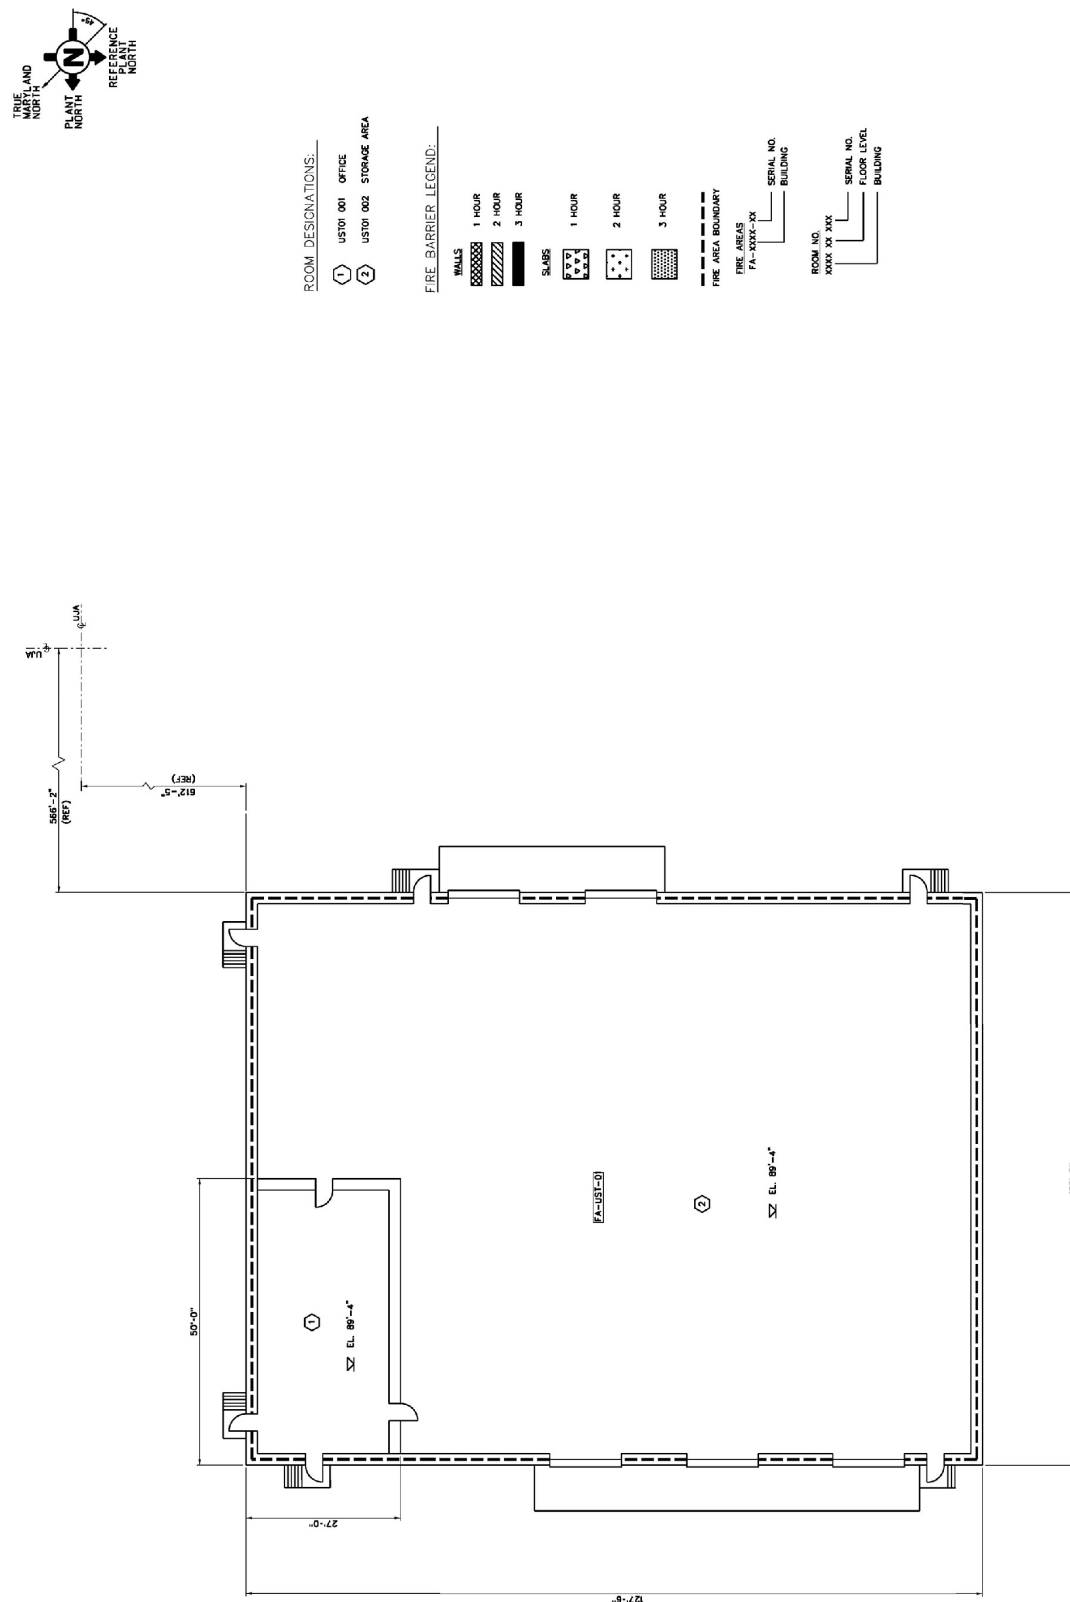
B-17— {Fire Barrier Location, Security Access Facility Plan}
